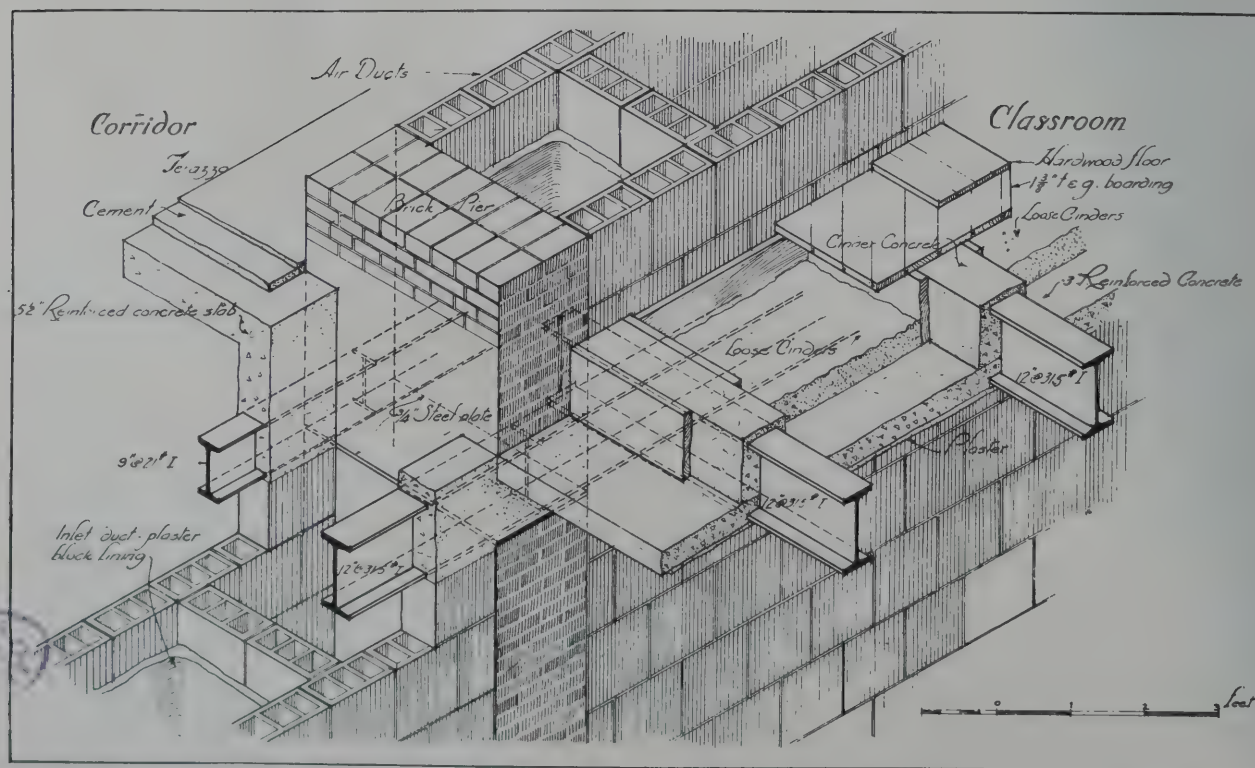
Diagram of Vent Shafts, Interior Piers and Floor Construction
